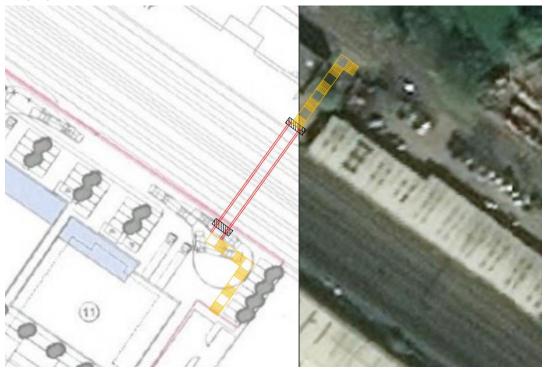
Proposed Structural Plan B – Walkway Only
